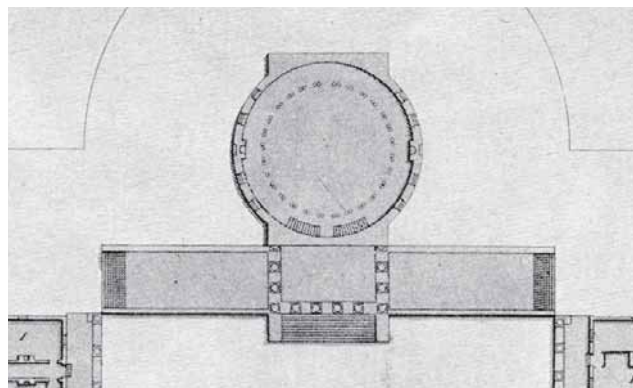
Peter Maverick engraving (1825), based on John Neilson's drawings (1822), of the ground floor plan of the Lawn (detail of Rotunda, below). [N-385, Special Collections, Edwin M. Betts Collection, UVA]
